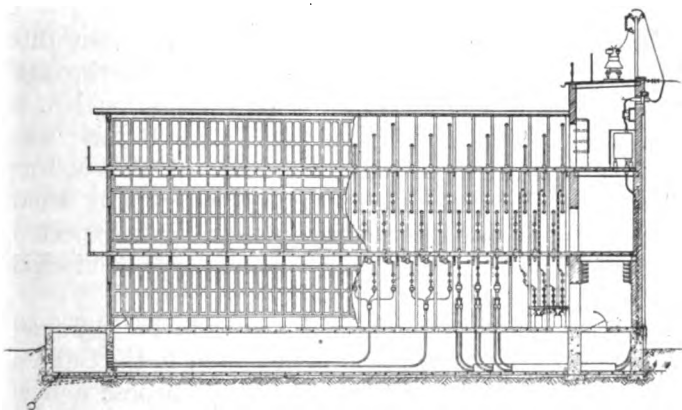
CROSS-SECTION OF BUS STRUCTURE THROUGH ONE BAY OF DISTRIBUTING STATION—LOOKING SOUTH
